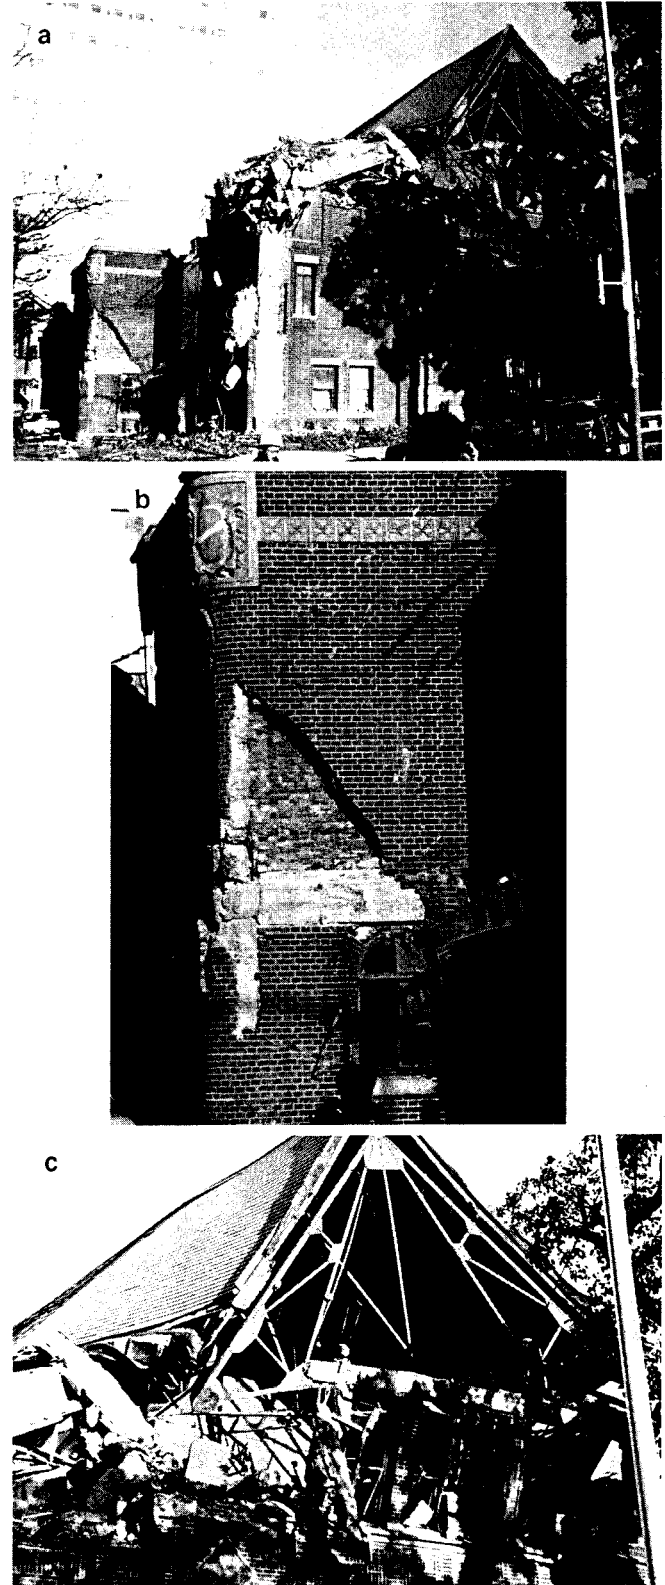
Damaged church having reinforced concrete frames infilled with unreinforced masonry: (a) global view; (b) minor damage to masonry wythe covering the infilled frames at the church's lower level; (c) close-up view of the damaged level where more openings existed in the infilled reinforced concrete frame.
